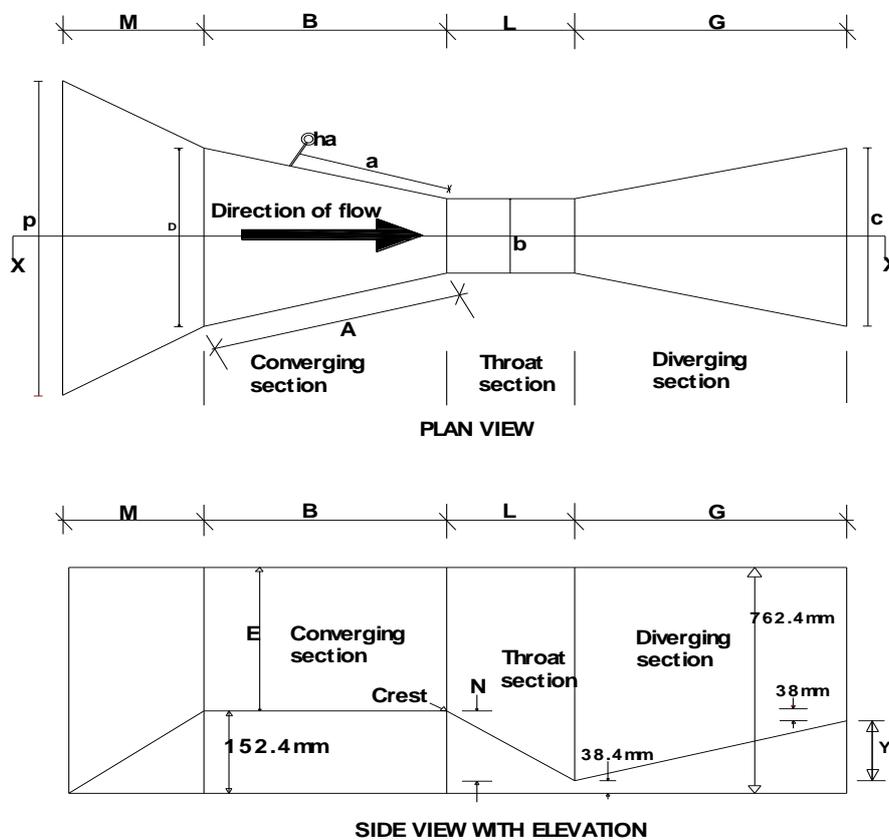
inches Parshall flume model, showing the Plan view and side view elevation
